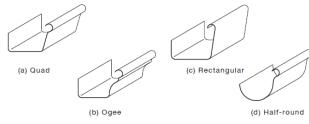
(A) TYPICAL EXTERNAL EAVES GUTTERS
